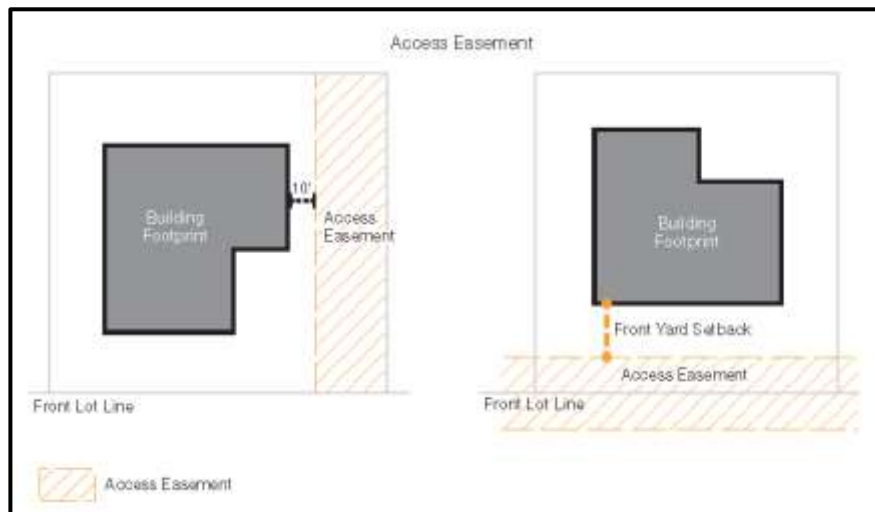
(E)(2)(g): Yard Setback Determination Attached Dwelling Units
